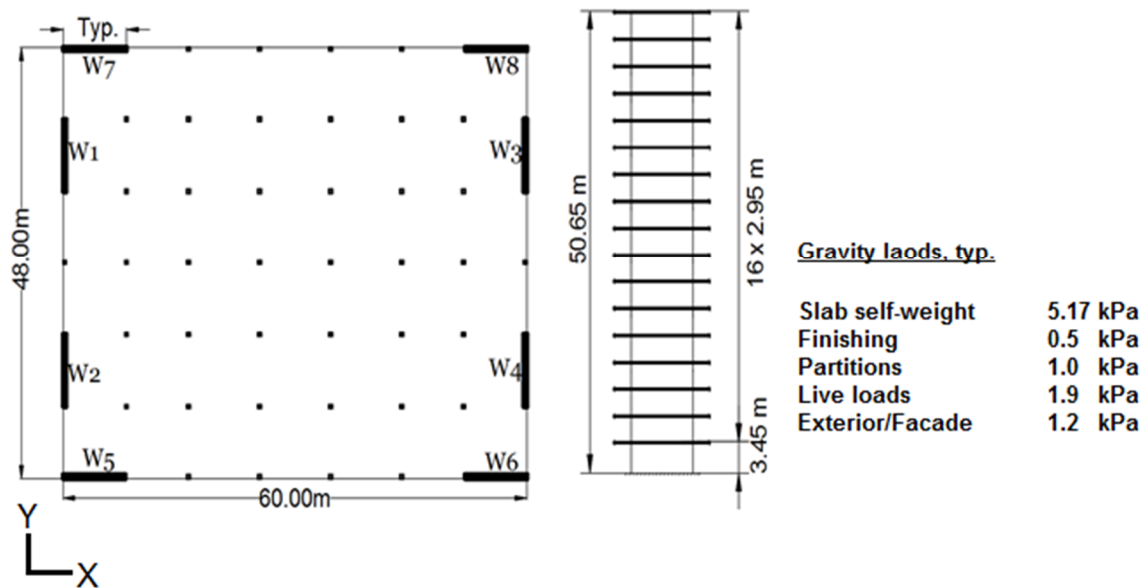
Studied building: plan view, wall elevation and gravity loads
